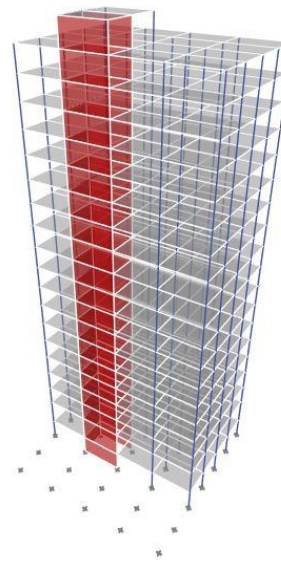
3D Sectional View of Structure with basic Base Shear Reduction Techniques
